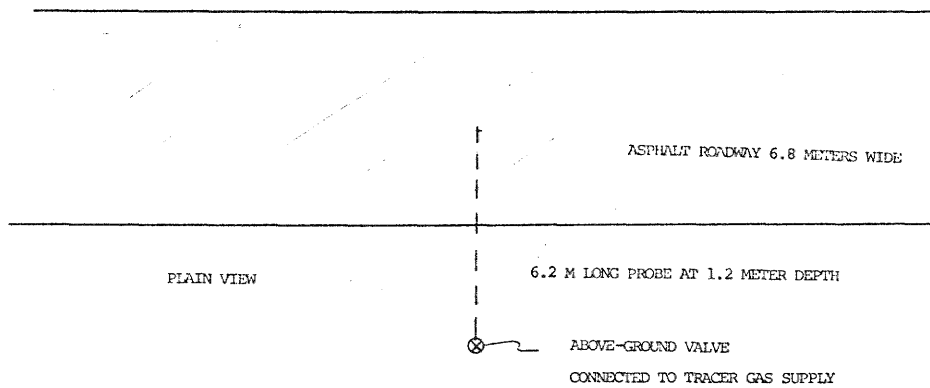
Leak #2, Under Existing Asphalt Road.
